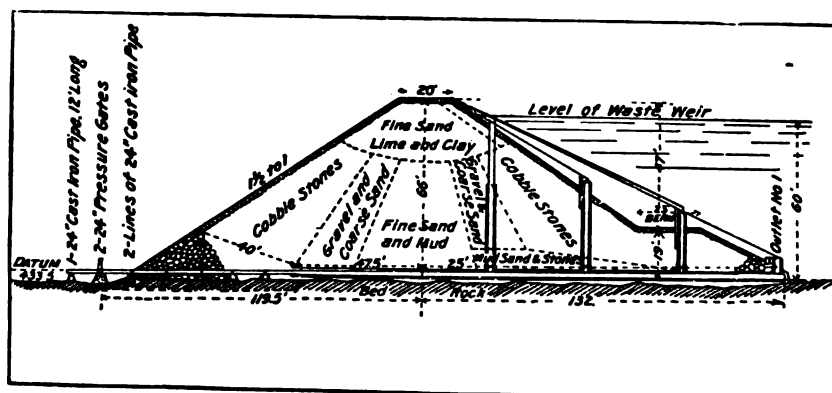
CROSS-SECTION OF LA MESA DAM.
